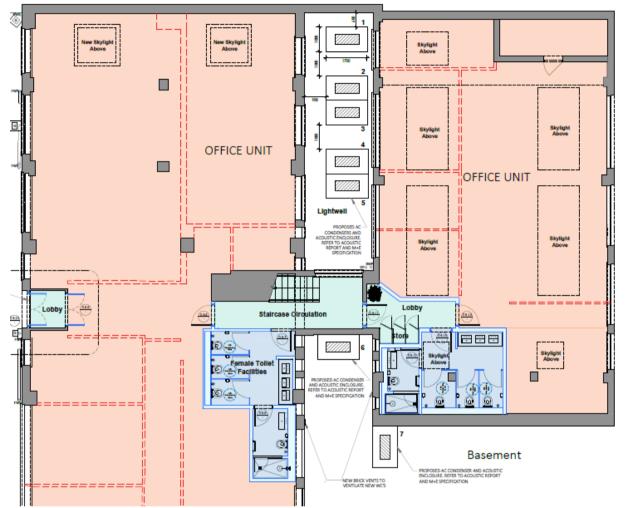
Floor plan drawing of lower ground floor showing locations of replacement roof lanterns and new skylights
